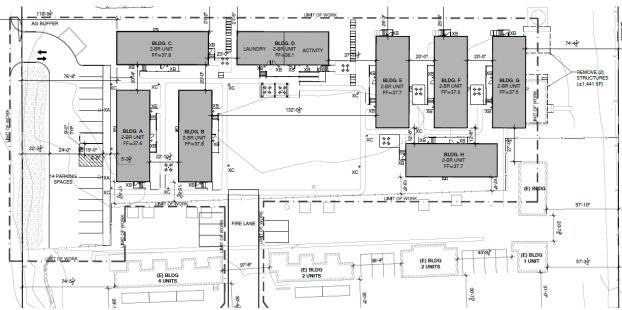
Proposed Site Plan (proposed buildings shaded in grey)
